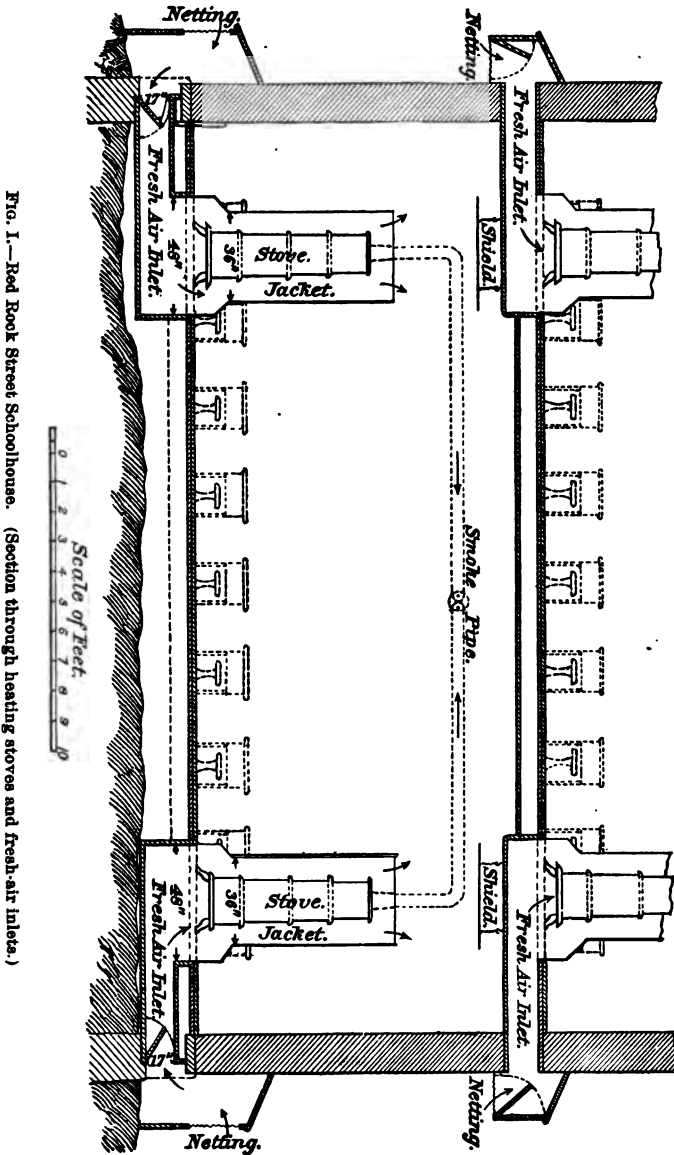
Red Rook Street Schoolhouse. (Section through heating stoves and fresh-air inlets.)
